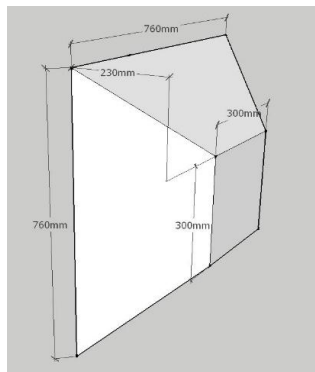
Site construction drawing of anchor cable head of main plant of Baihetan Hydropower Station
